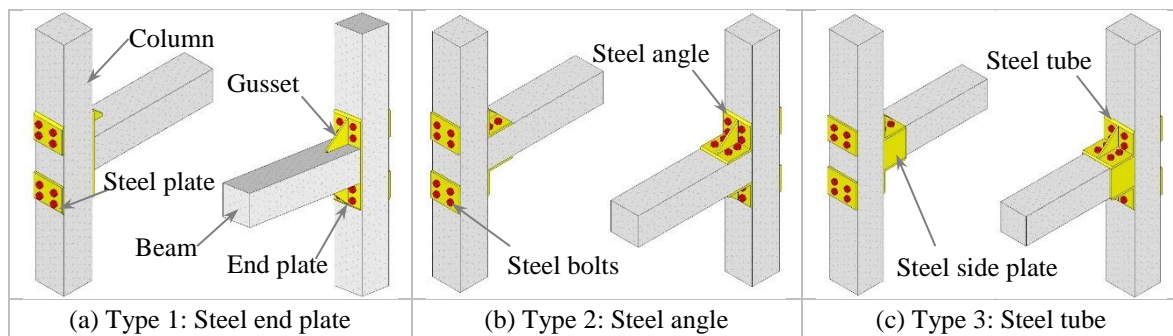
Schematic layout of possible types of removable rigid beam column connections
